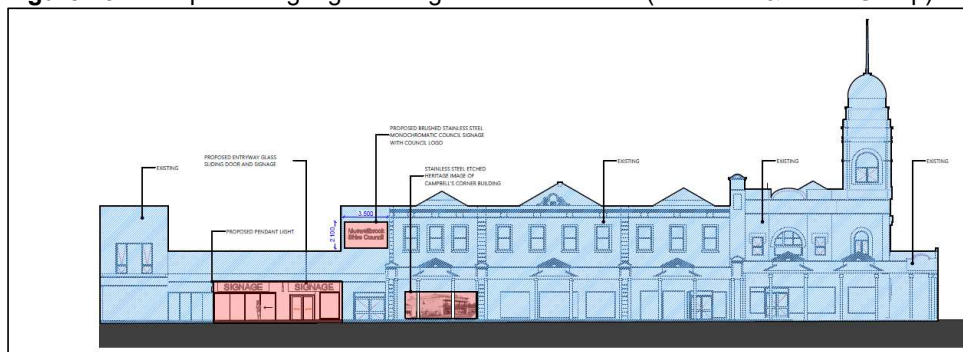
Proposed Signage – Brook Street Elevation (Source: A&H Eco Group)
